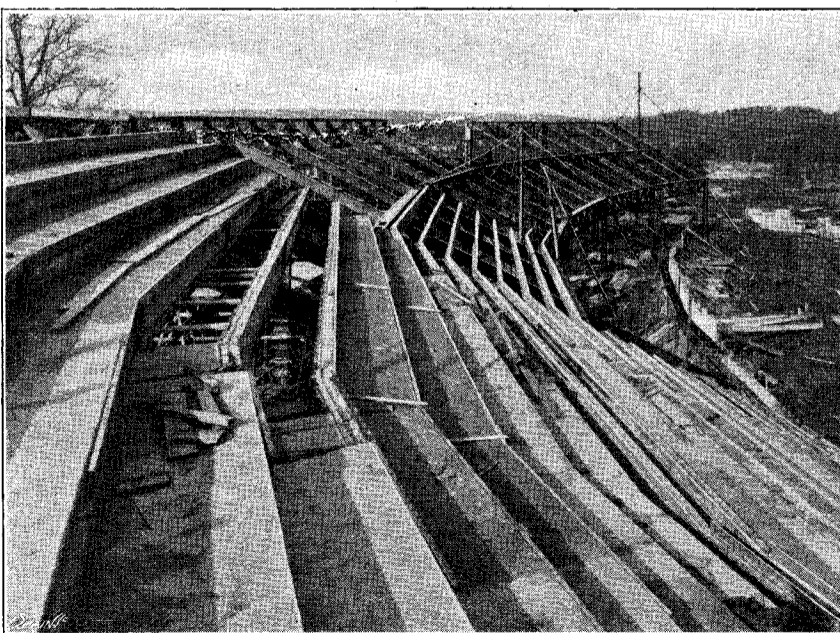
VIEW SHOWING ERECTION OF TERRACES OF CONCRETE STEPS
